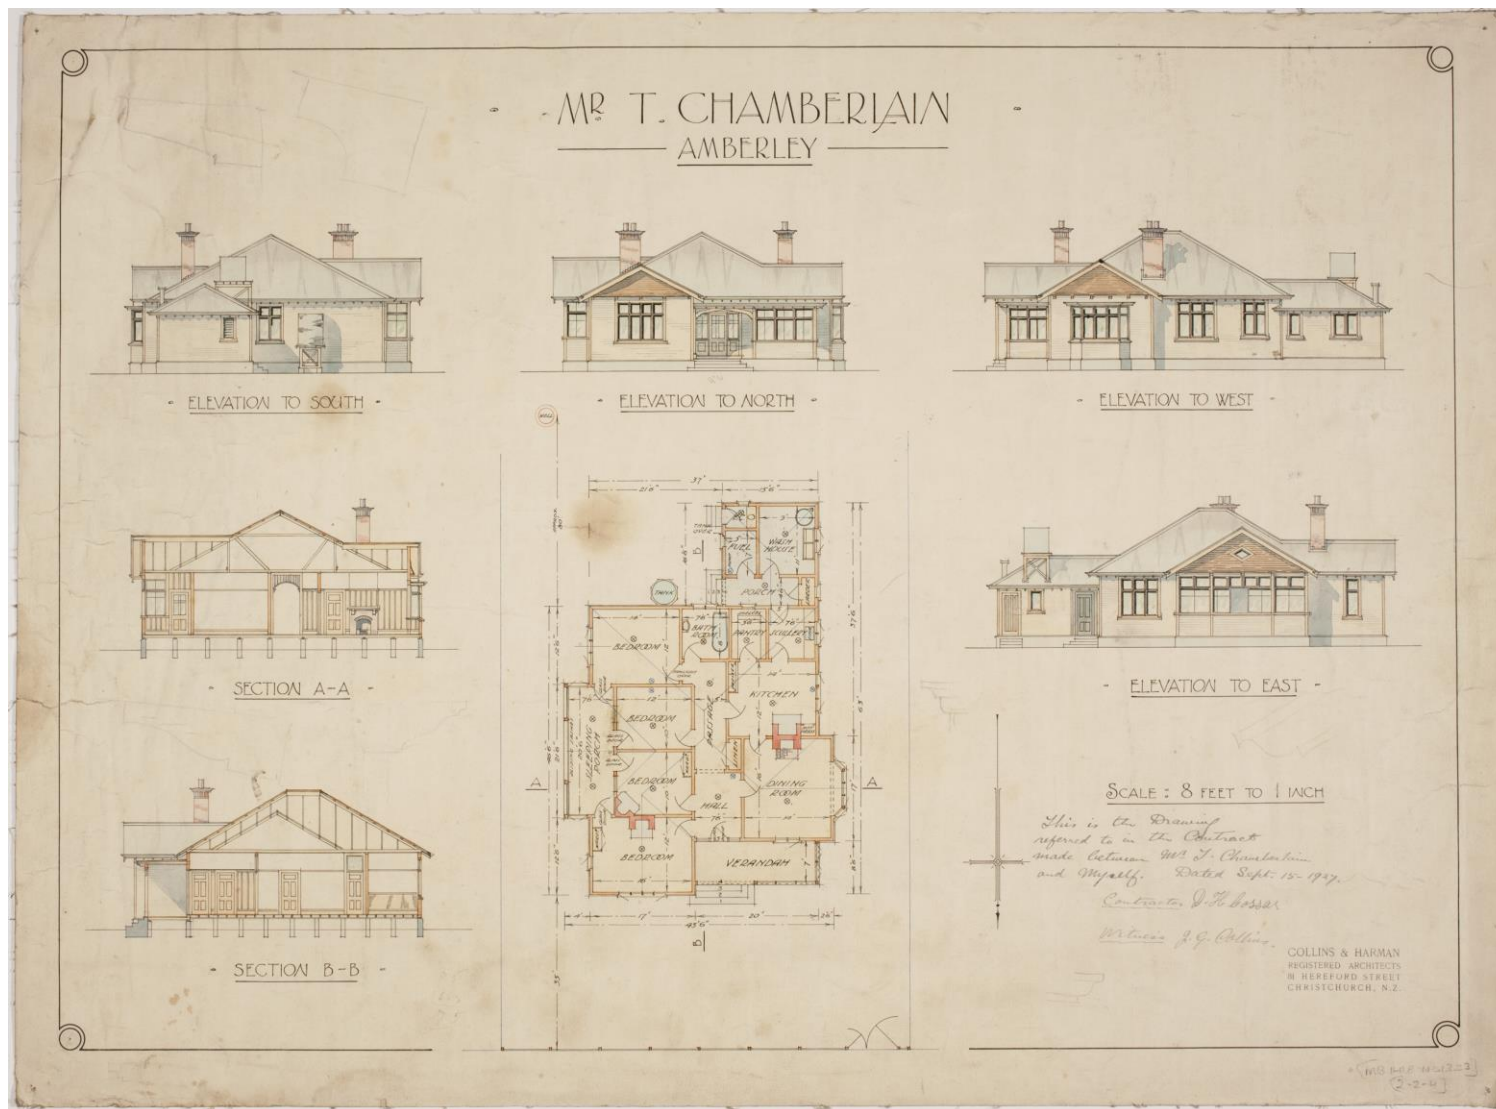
Collins and Harman, Mr T. Chamberlain, Amberley, plan, elevations and sections (1927).
